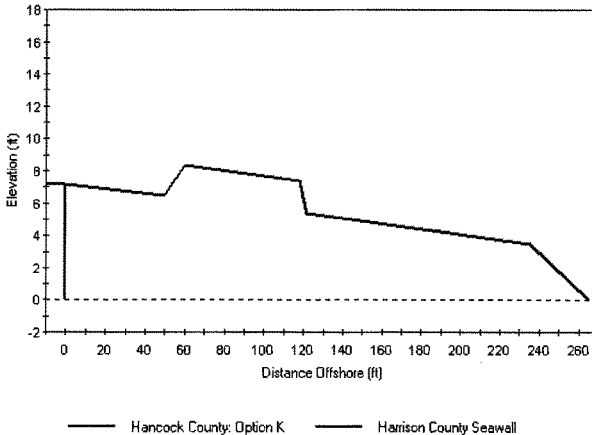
Typical Cross Section, Harrison County Option K
